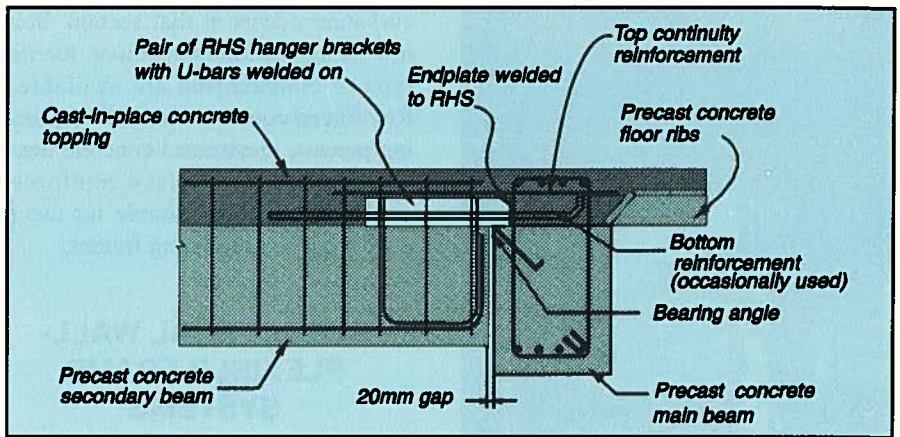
Example of secondary beam to main beam connection using a rectangular hollow steel (RHS) section seated on a steel angle (Ref. 3).
